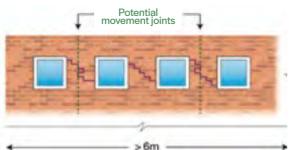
Long runs of uninterrupted brickwork, especially when vertical loading is low, can lead to diagonal cracking of narrow brickwork panels between window openings.
